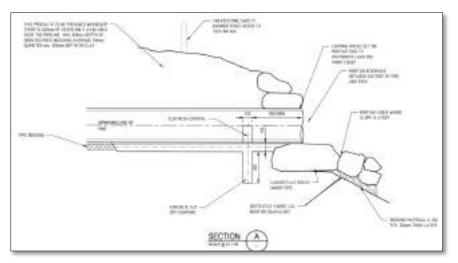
Pipe End Wall Detail from Dwg 22084.2DP01 Rev A
